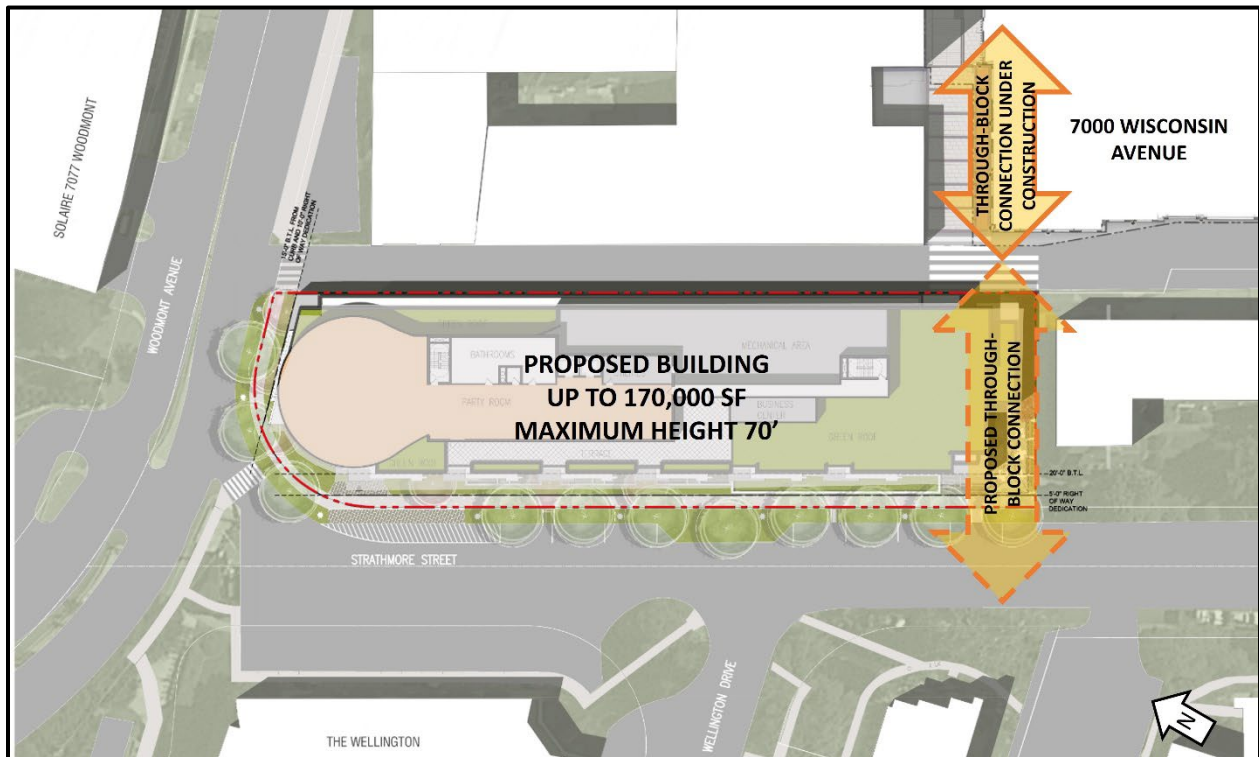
Concept Rendering of Sketch Plan No. 320240030
